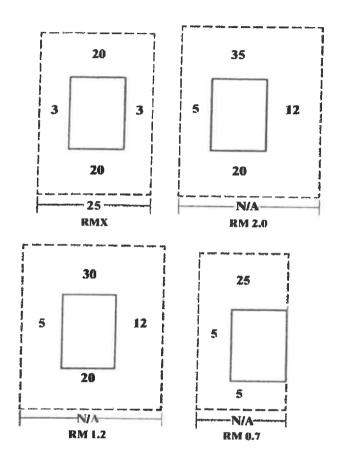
Minimum Setbacks for Multi-Family Buildings 35 ft. in Height
